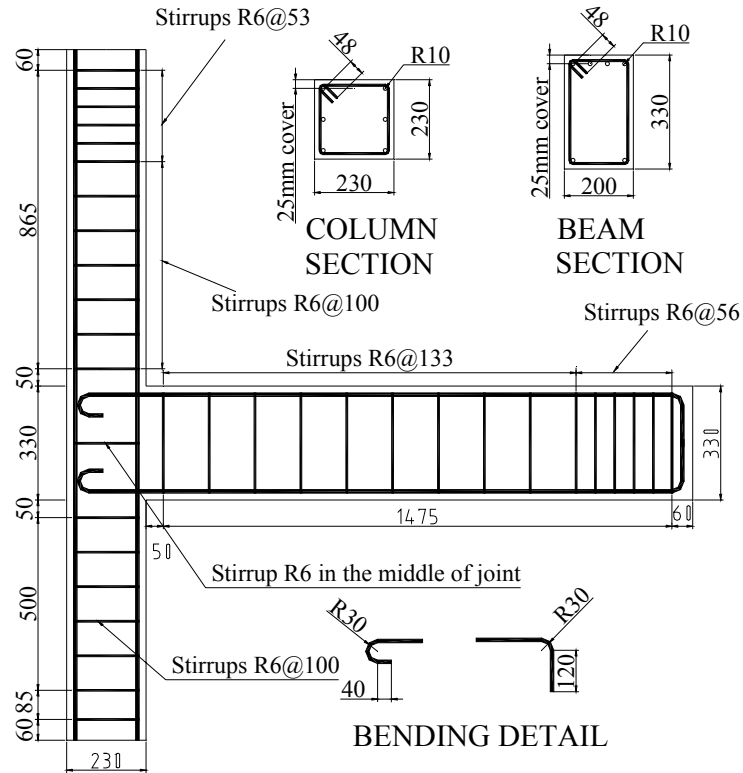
Dimensions and reinforcement details of the as-built specimen TDP1
